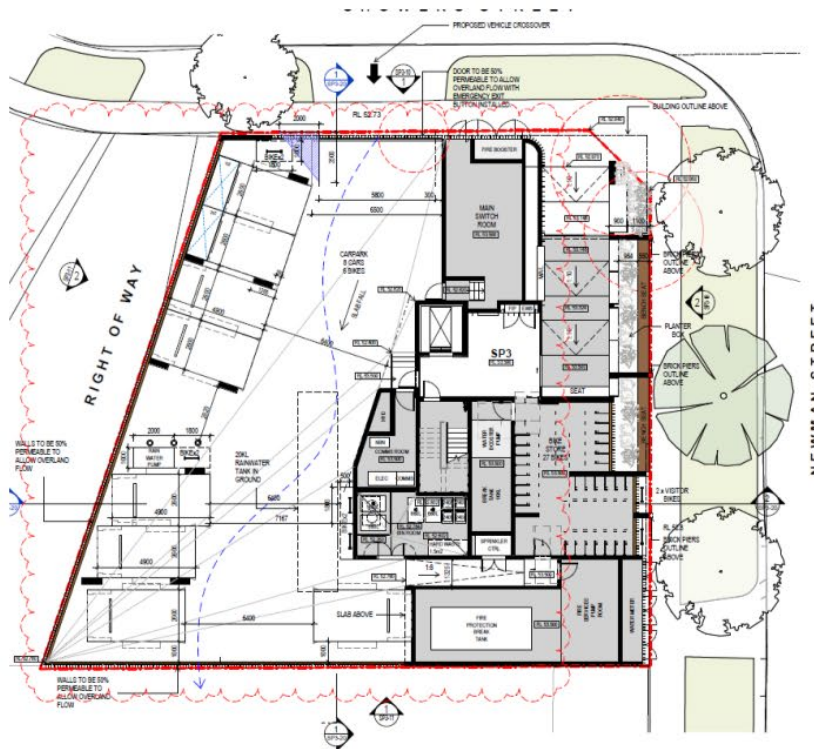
Proposed ground floor plan showing the location of resident and visitor bike parking spaces (Source: Hayball Architects dated 29 November 2022)
